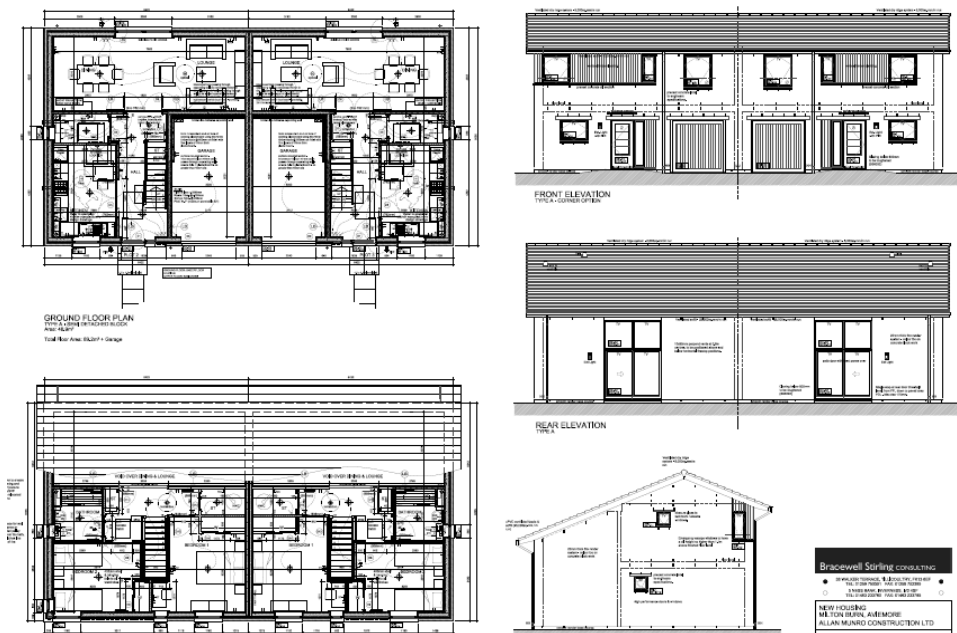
Existing Consented House Type (Extract from Applicant's drawing 3918/03/016 for information only)
